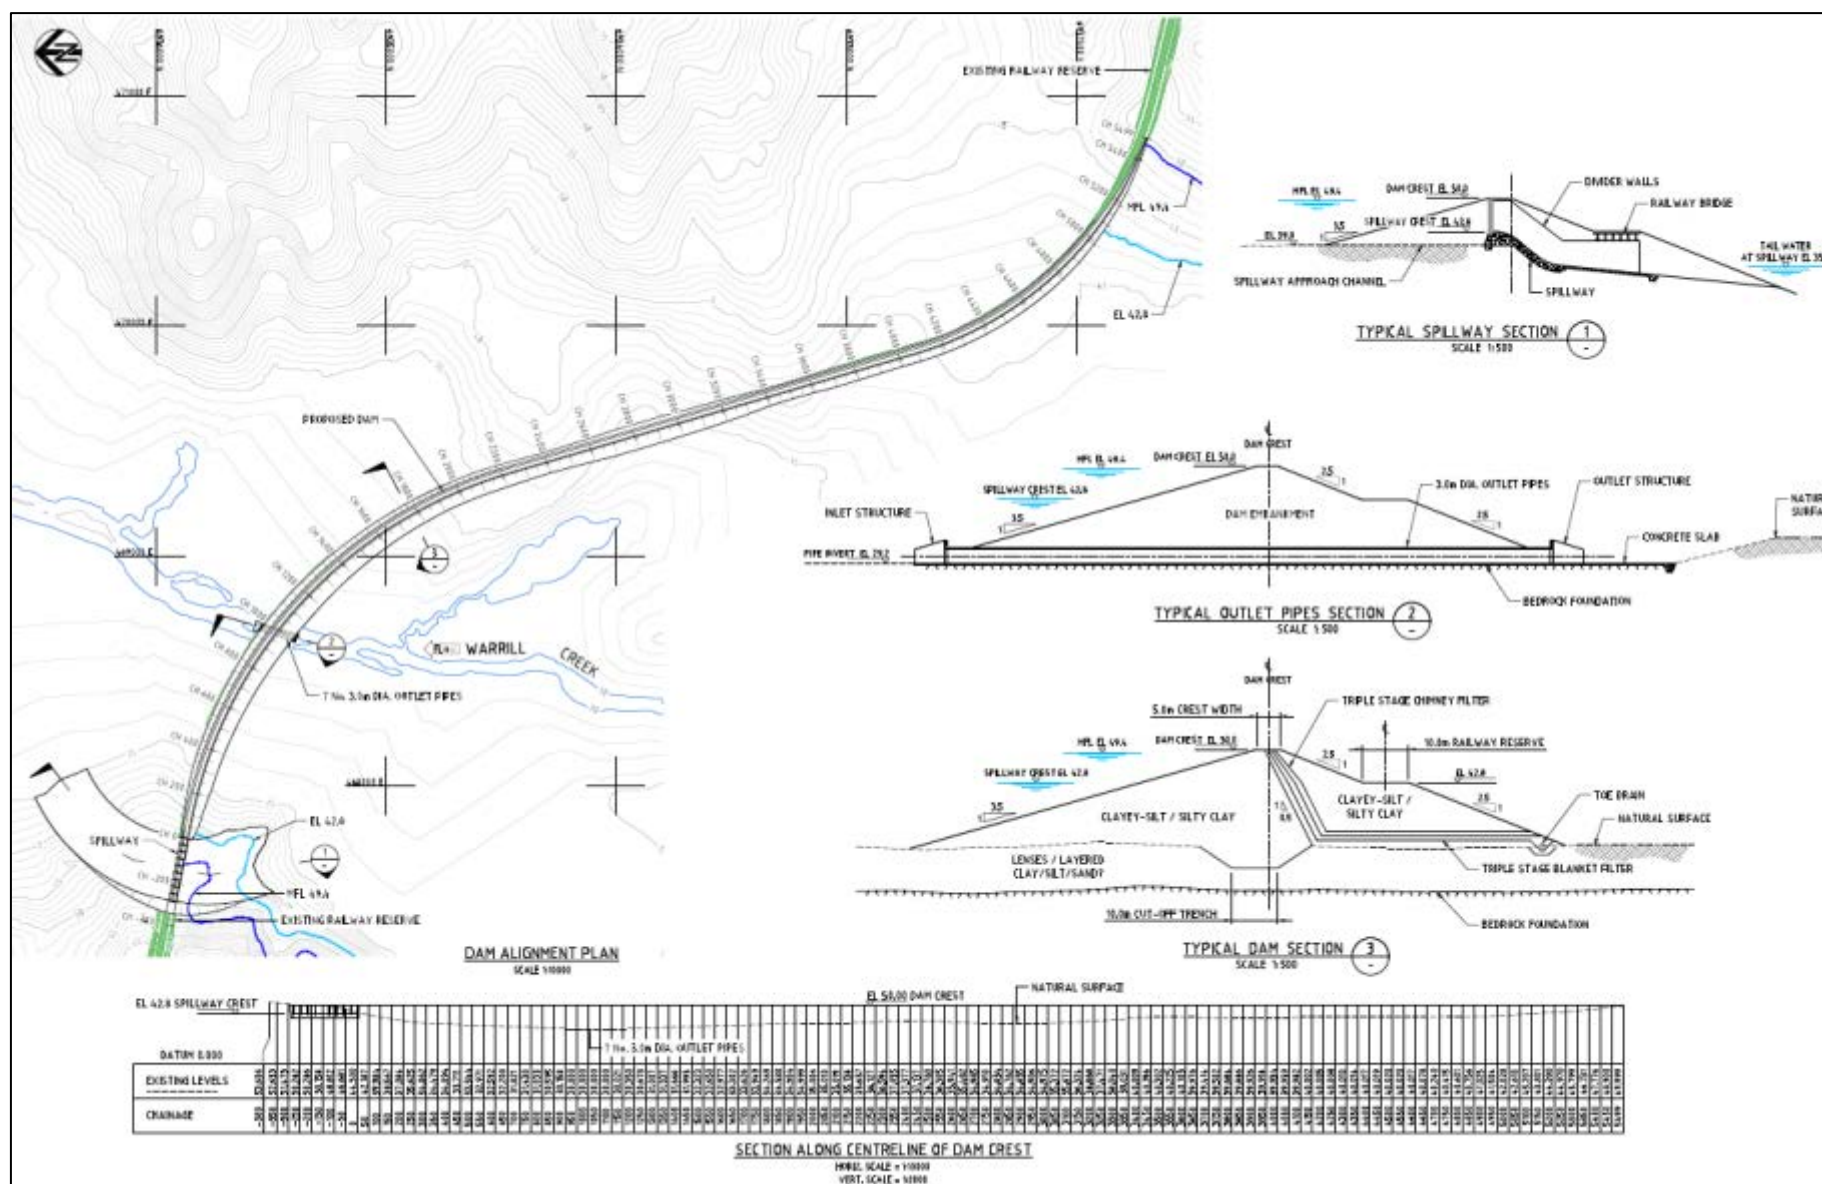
General arrangement and typical cross sections for potential flood mitigation dam, Option B1 - lower Warrill Creek AMTD 14.6 km
